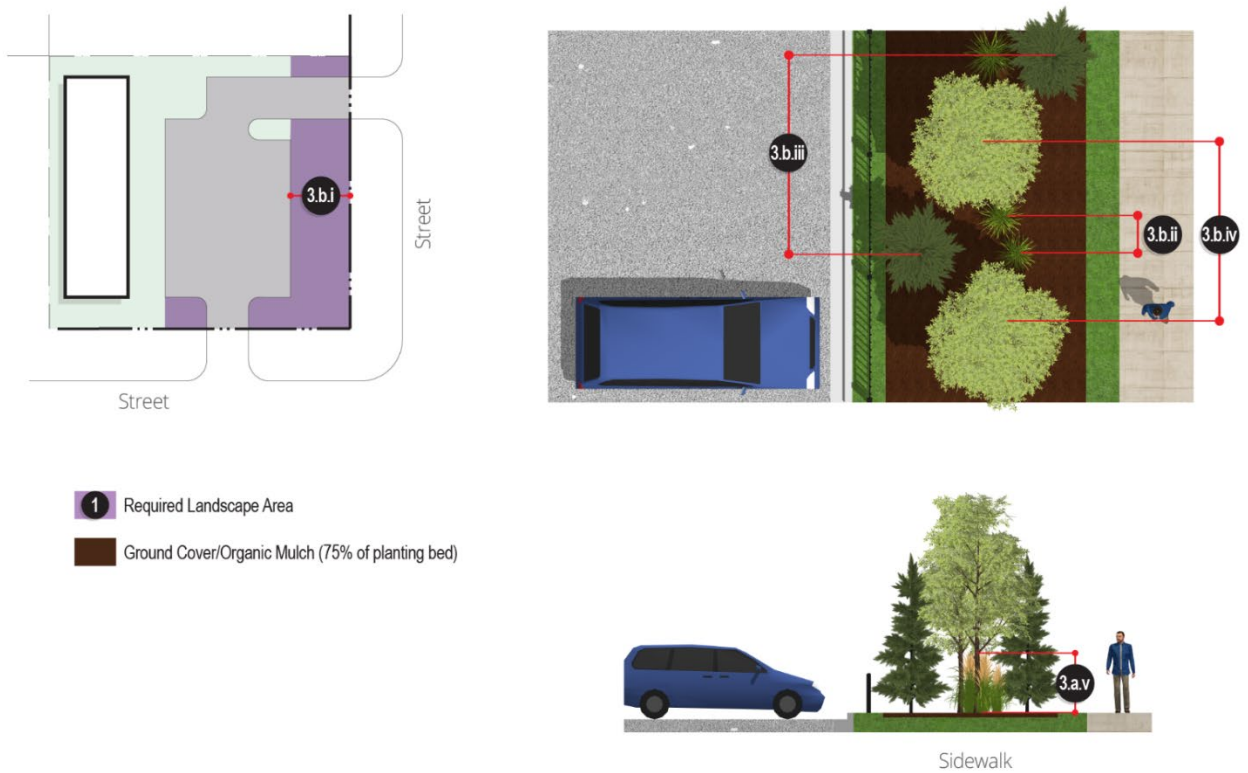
Parking Area Perimeter Landscape Zone - Halsted Street, Building 30 Feet or Less From Back of Curb
